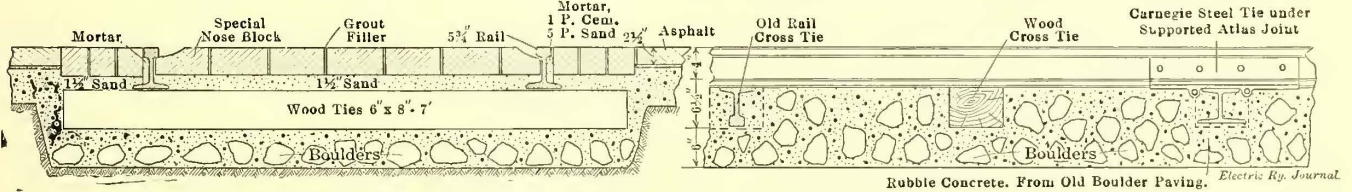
Ft. Wayne & Wabash Valley—Standard Rubble Concrete Foundation Construction
